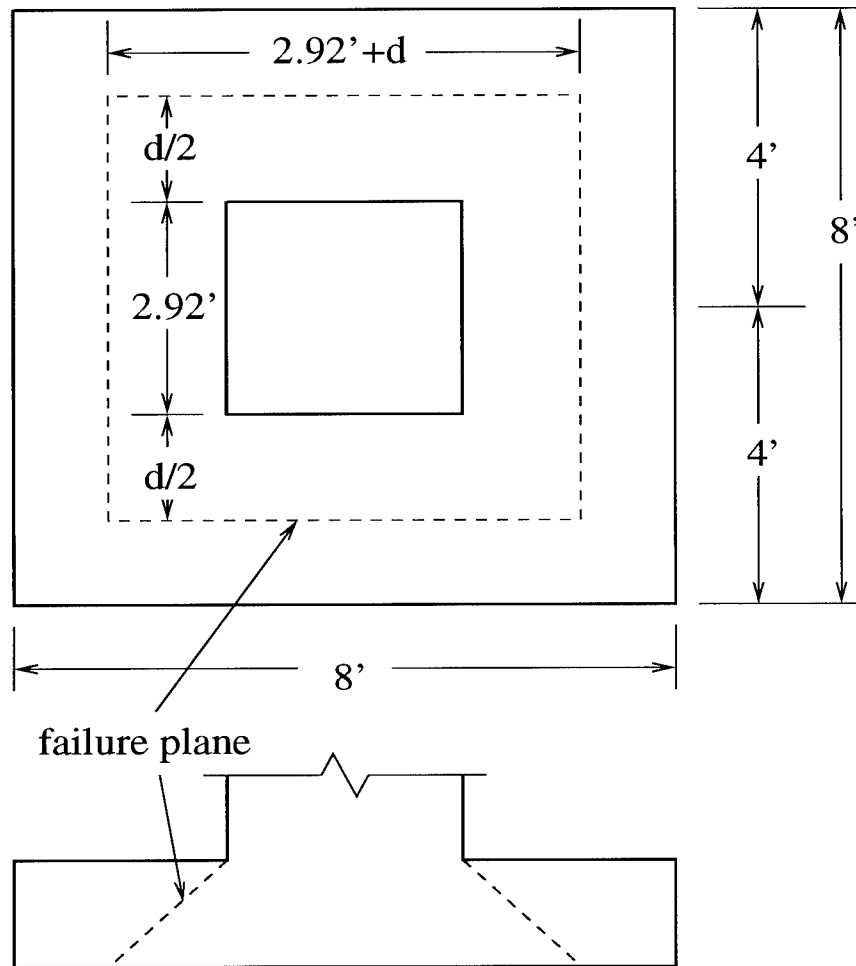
Two-Way Shear on Column Footing: Failure Plane of Column Punching Through Footing
